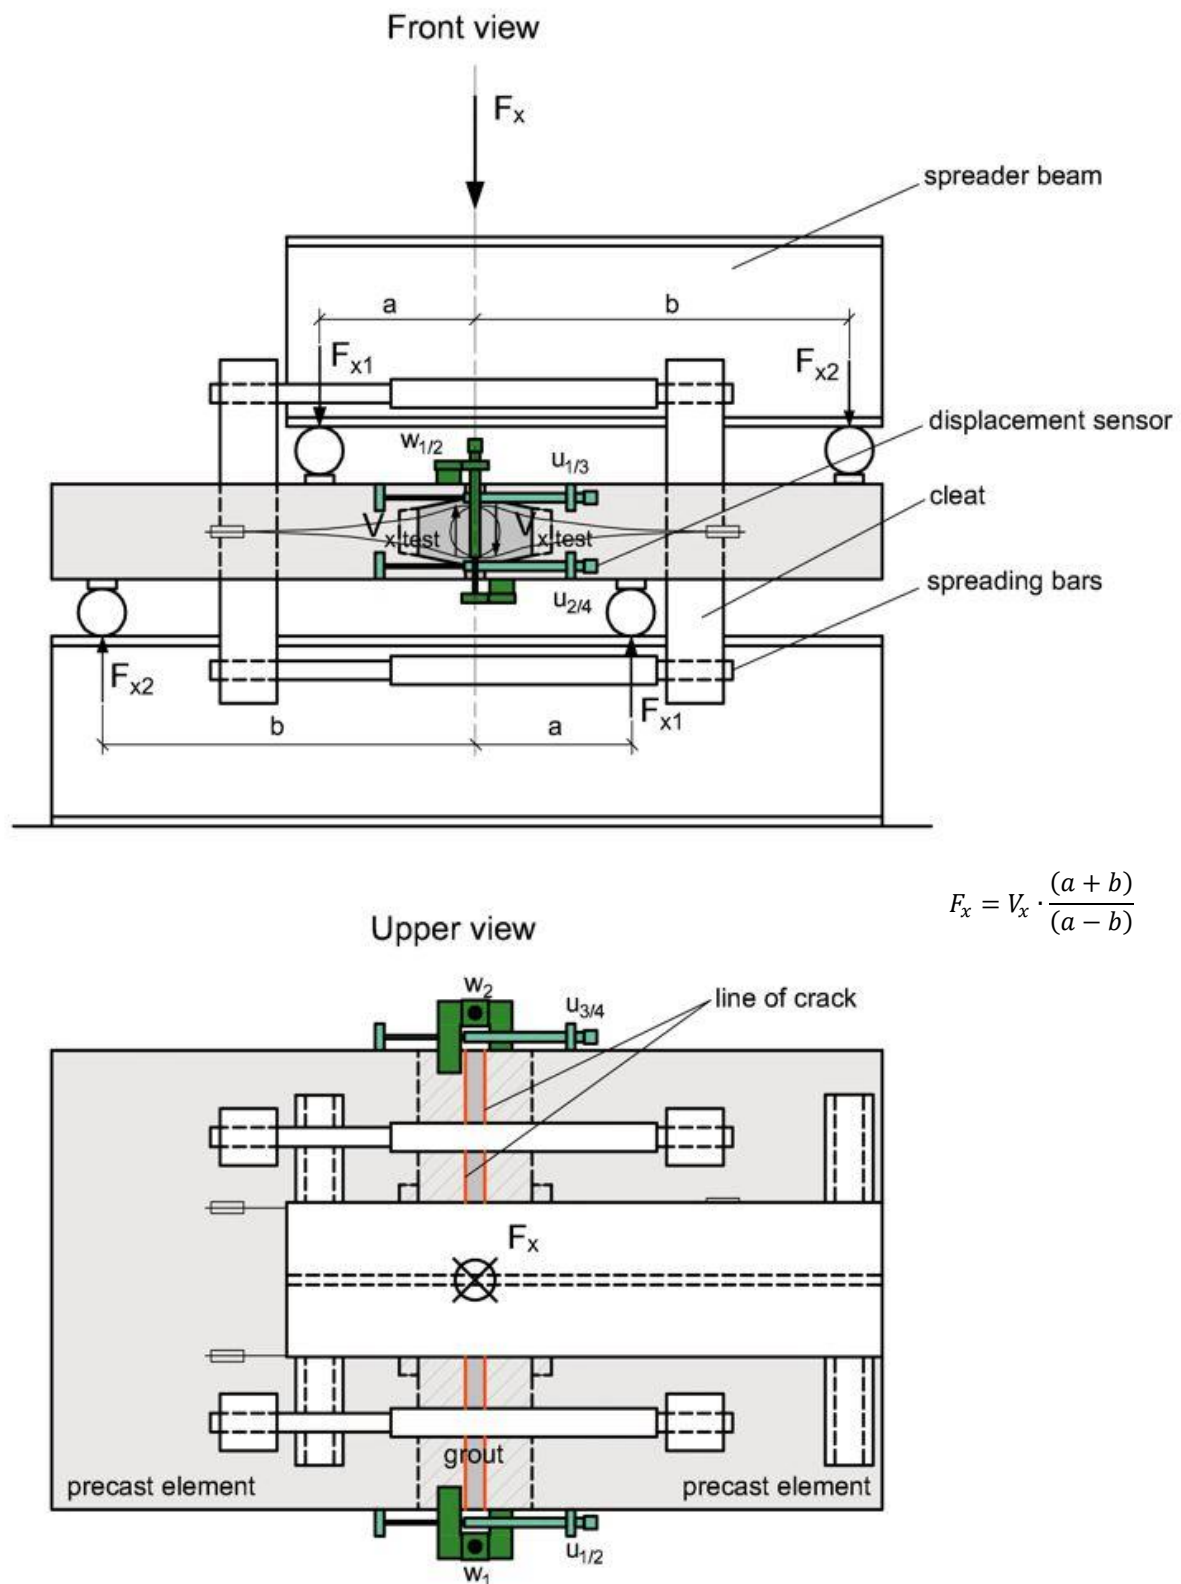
Test setup for connections of two precast concrete elements
